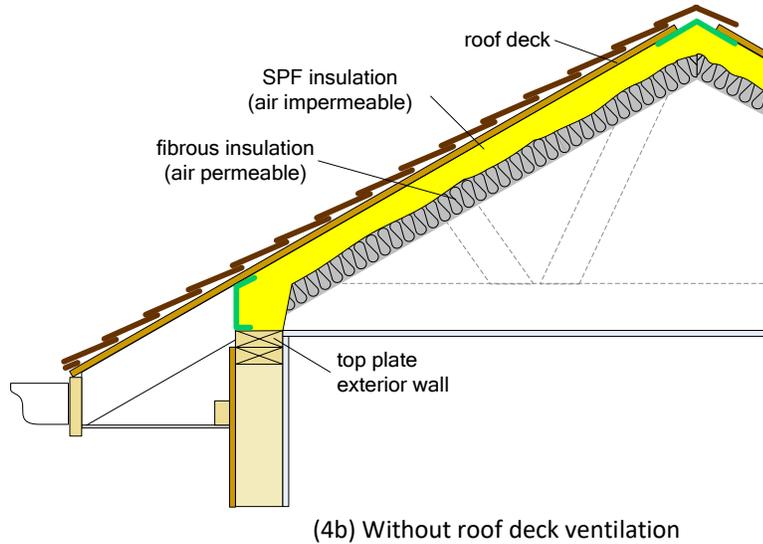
HYBRID INSULATION UNVENTED ATTIC AND CATHEDRALIZED CEILING DESIGNS—VERTICAL SECTION VIEW
